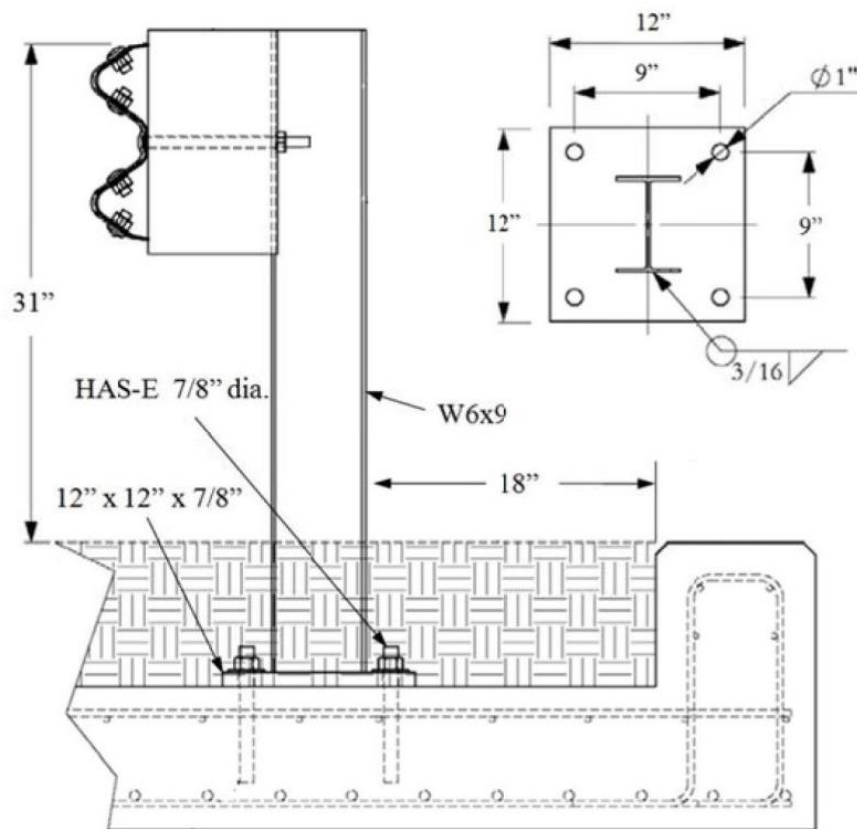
MASH-Compliant, MGS Guardrail Attachment to Low-Fill Culvert [8]
